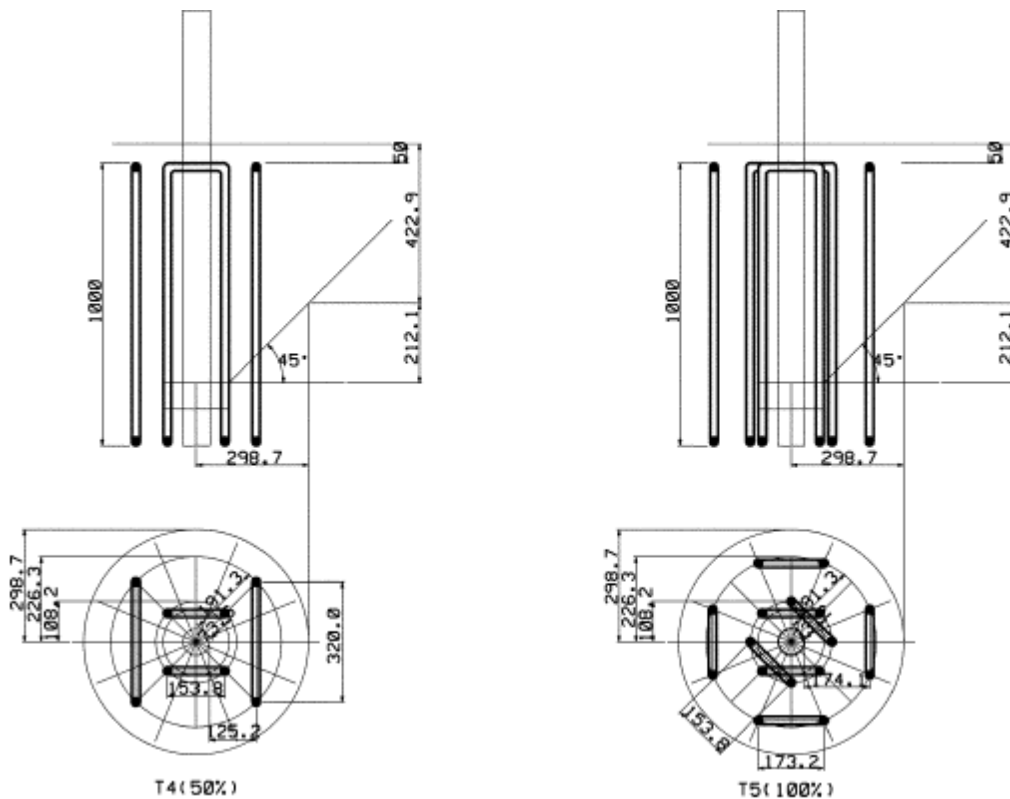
Anchor reinforcement in Lee et al. (2007)
